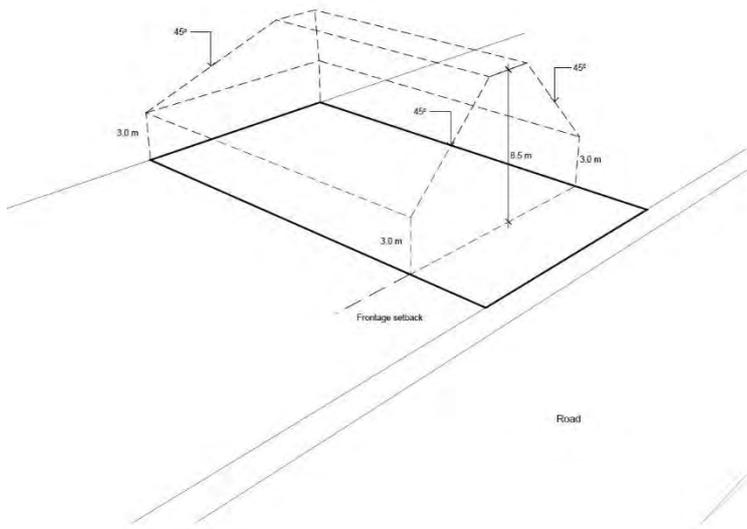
Building envelope as required by clause 10.4.2 A3(a)
